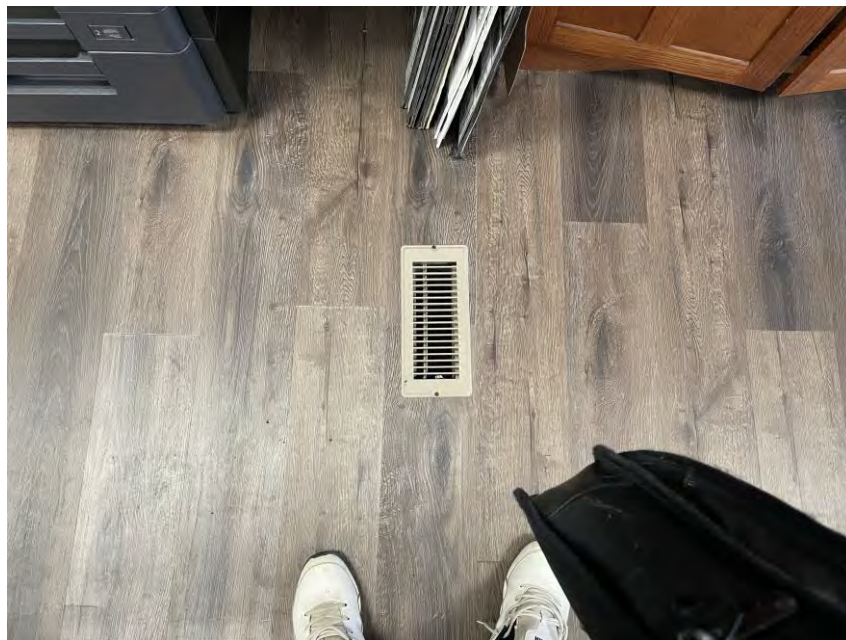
Supply air grille. Soft flooring around grill likely due to subfloor being cut to much to install grille.
